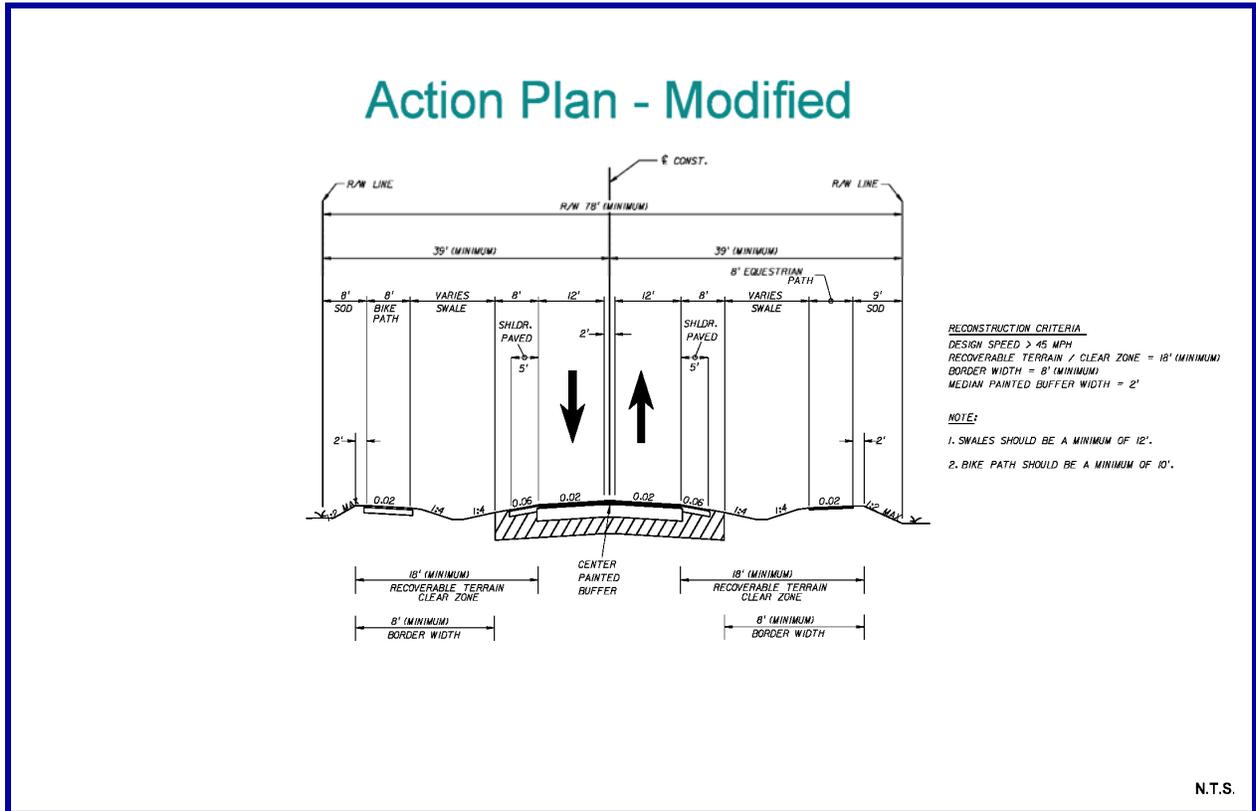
Action Plan (Modified) Proposed Typical Roadway Section
